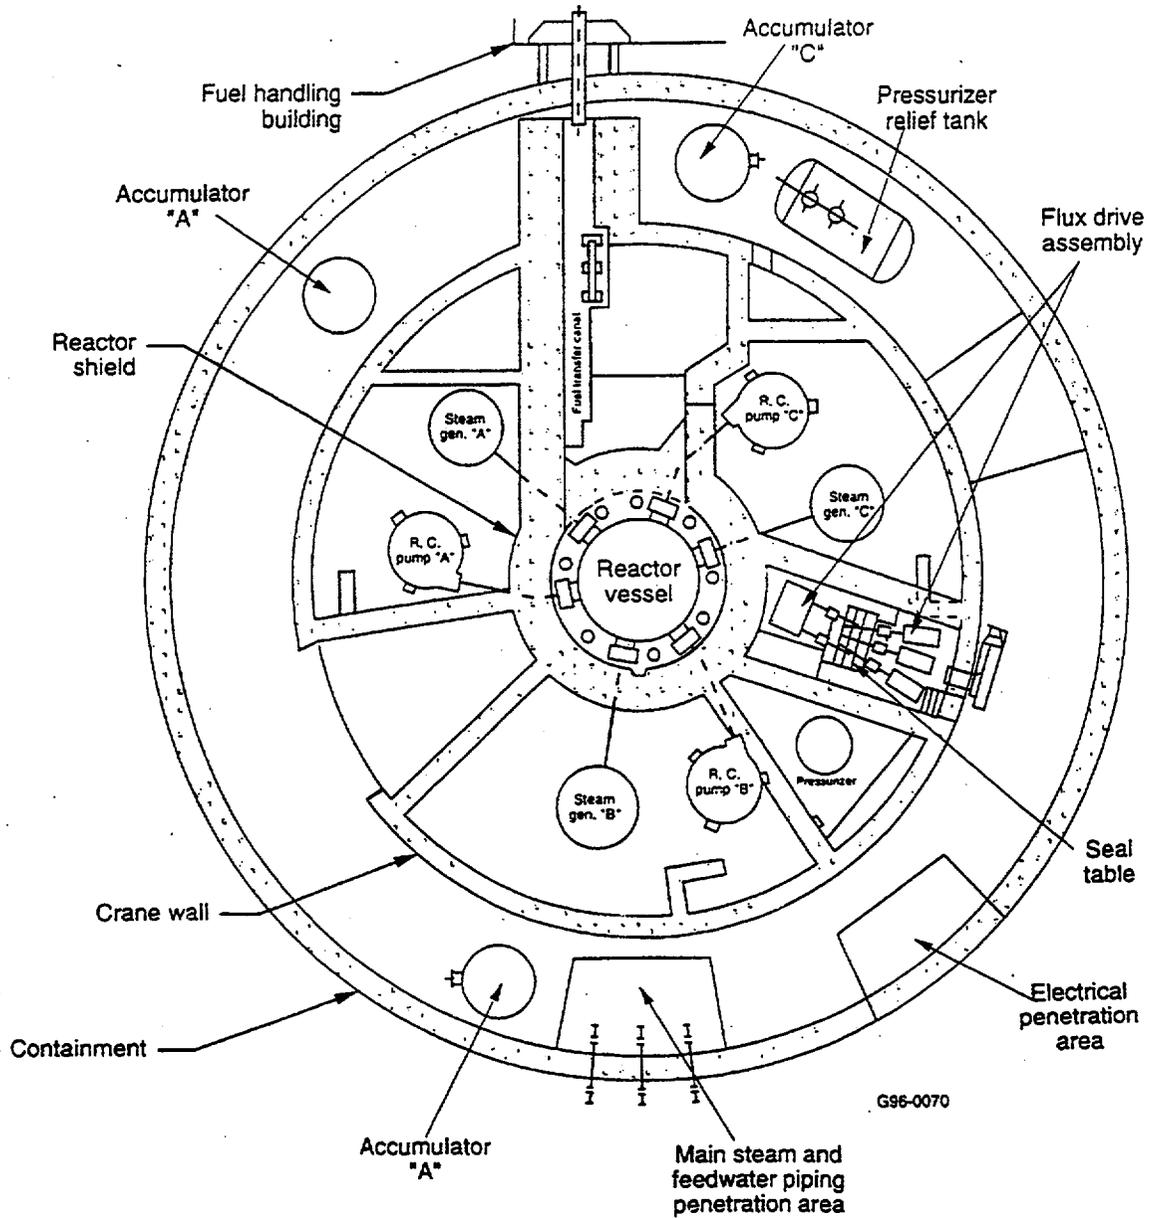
Older SEP-III PWR (Westinghouse 3-loop) inside containment plan view.
